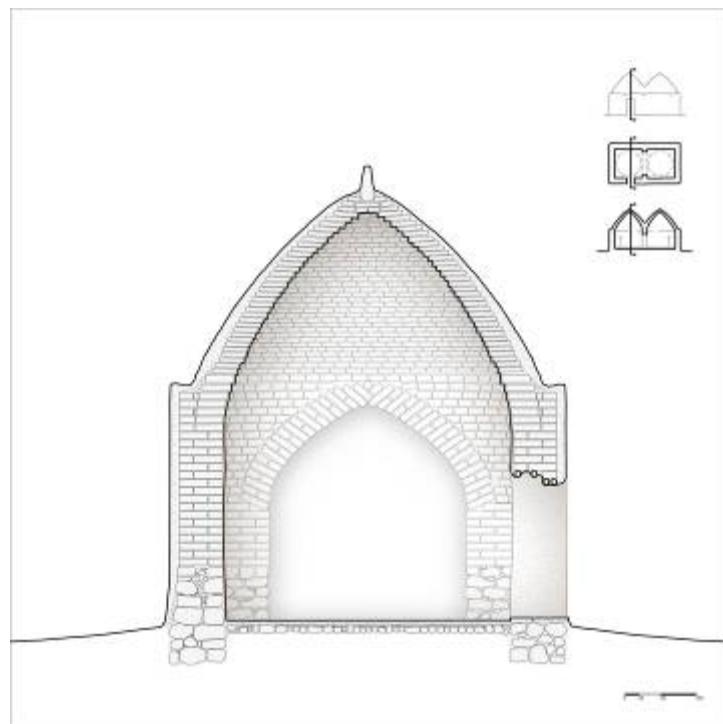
Vertical constructive section of a Sultanya Dome (credits Onnis S., 2009)
